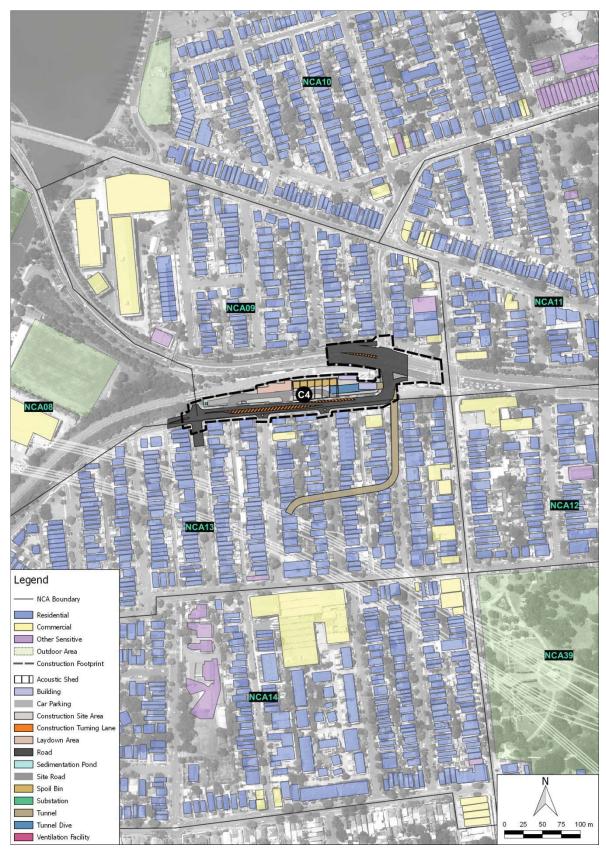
Indicative site layout – Darley Road civil and tunnel site
